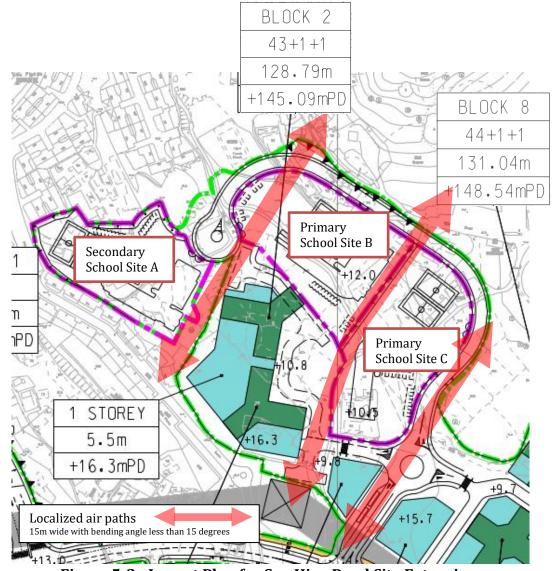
Layout Plan for San Hing Road Site Extension
